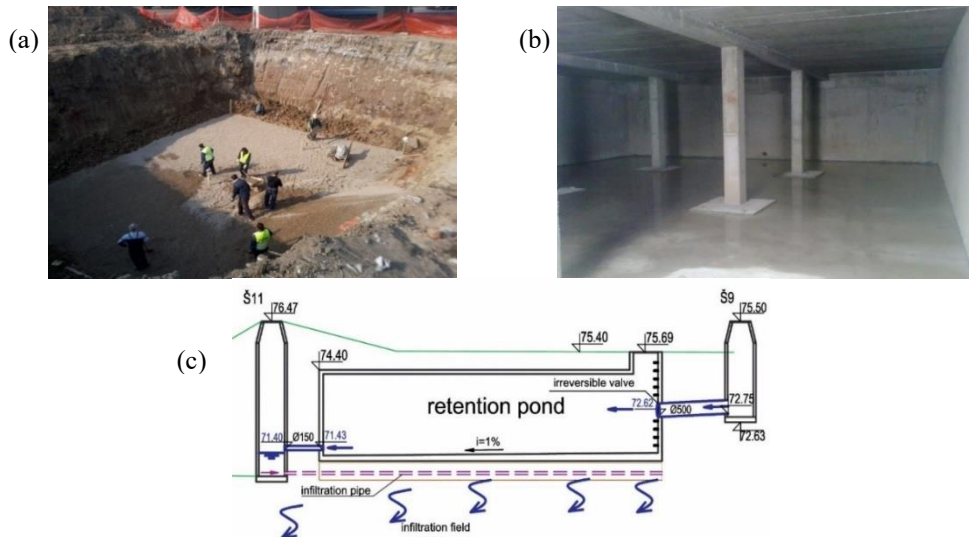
Retention pond as a receiving body for the Gazela Bridge drainage system: (a) during construction, (b) during operation, and (c) cross section showing redirection to the sewer system and the infiltration system [15]
